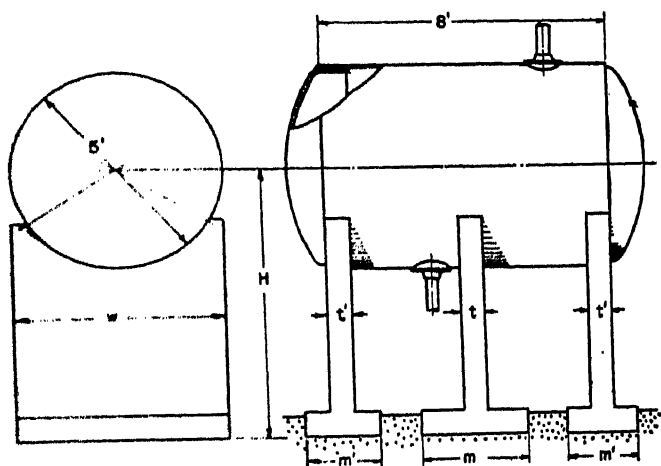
Horizontal Tank Supported by Concrete Piers.
